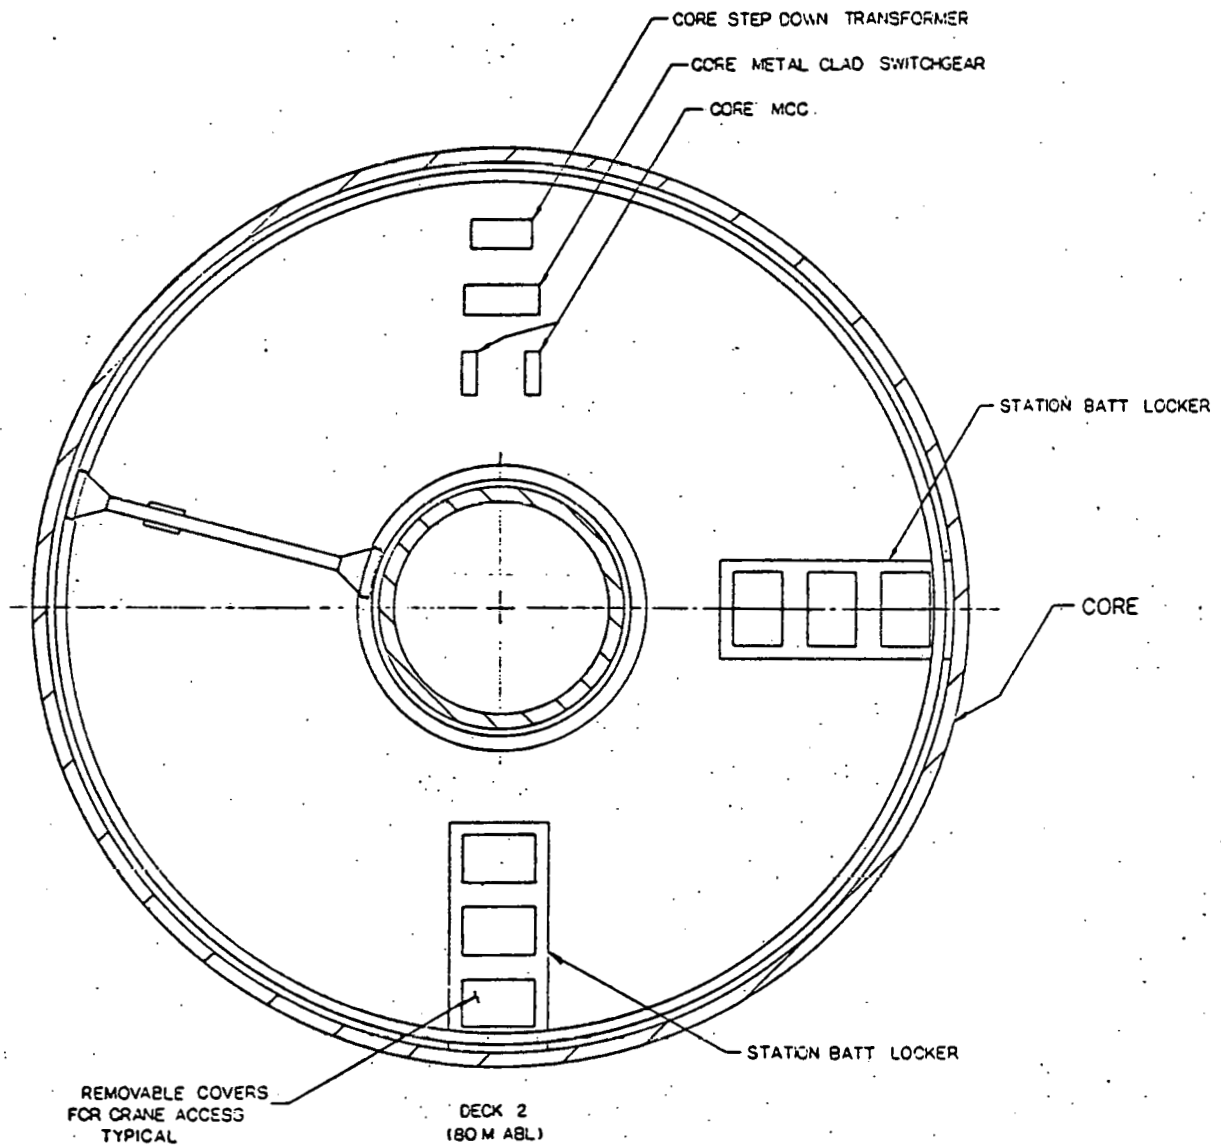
Standby Power and Auxiliary Electrical Equipment Arrangement, 400-MW(e) Spar, Deck 2
